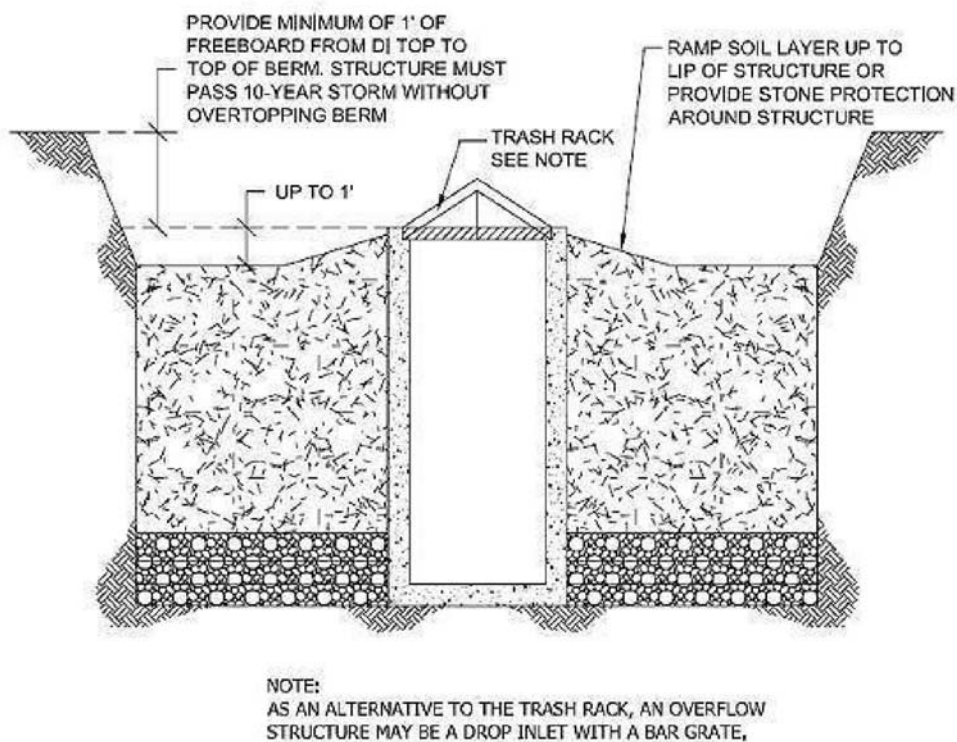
Typical Detail of how to prevent bypass or short-circuiting around the overflow structure (source: VADCR, 2010)
